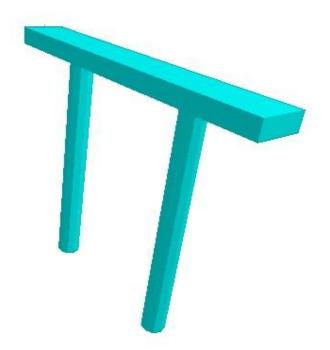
Design Model of Pier and Pier Cap (in STAADPro)
